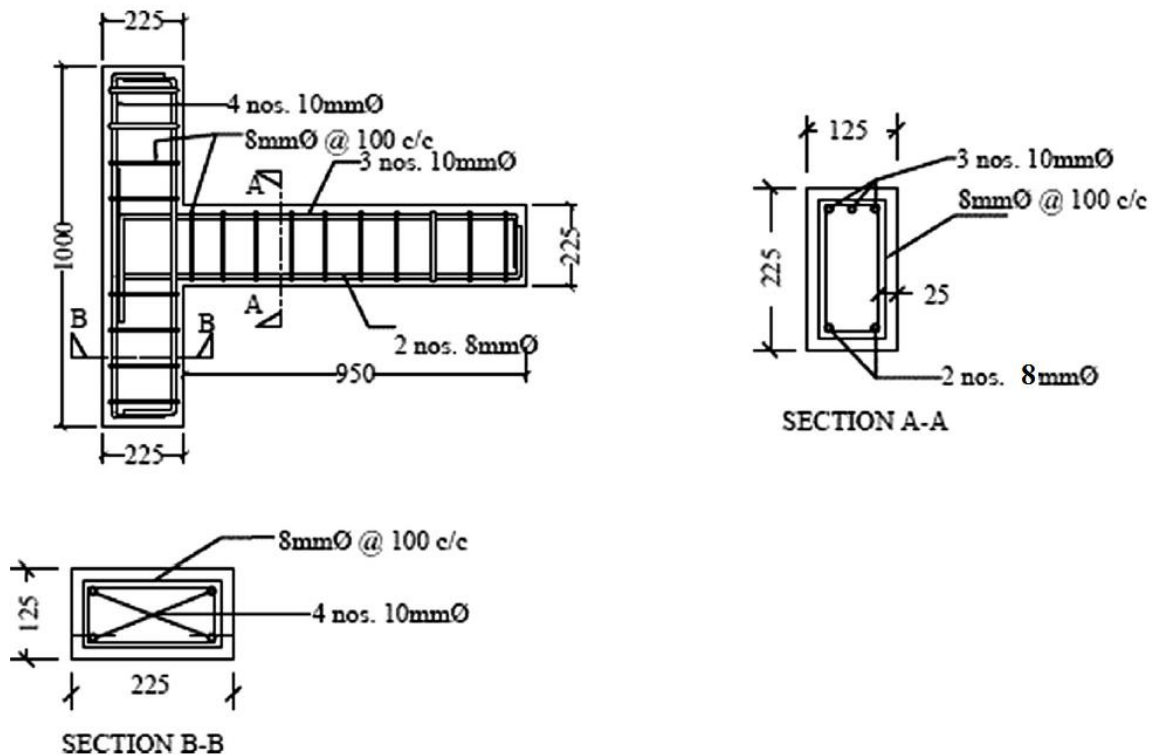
17 Reinforcement detail of BCJ (sharma et al.2019)
